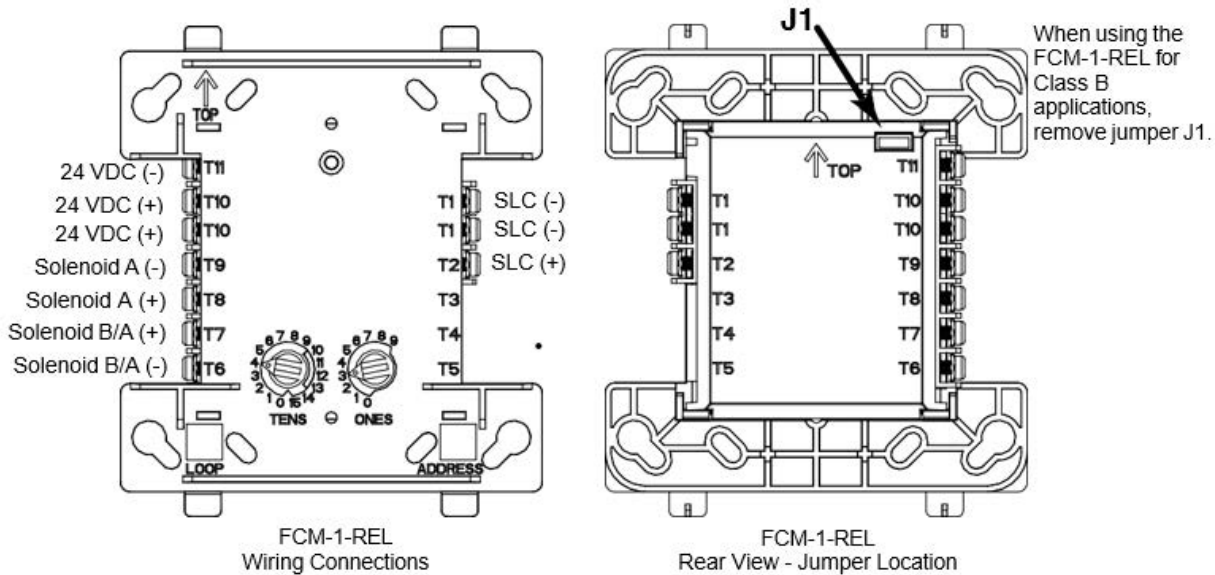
FCM-1-REL Wiring Locations and Rear View - Jumper Location
